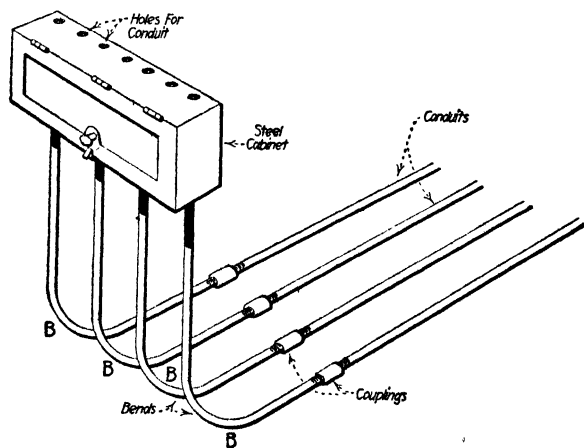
Uniformly-bent conduit entering a steel cabinet.
